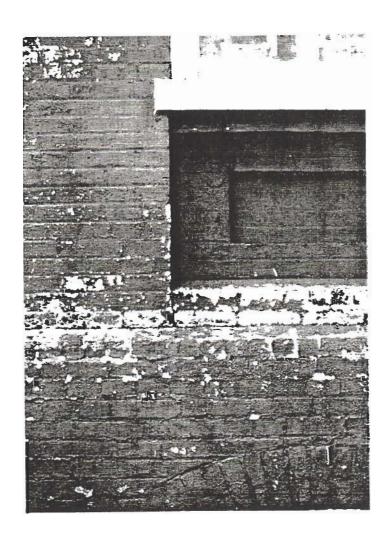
First Floor Window Recessed Brick Panel Detail at North Facade.
